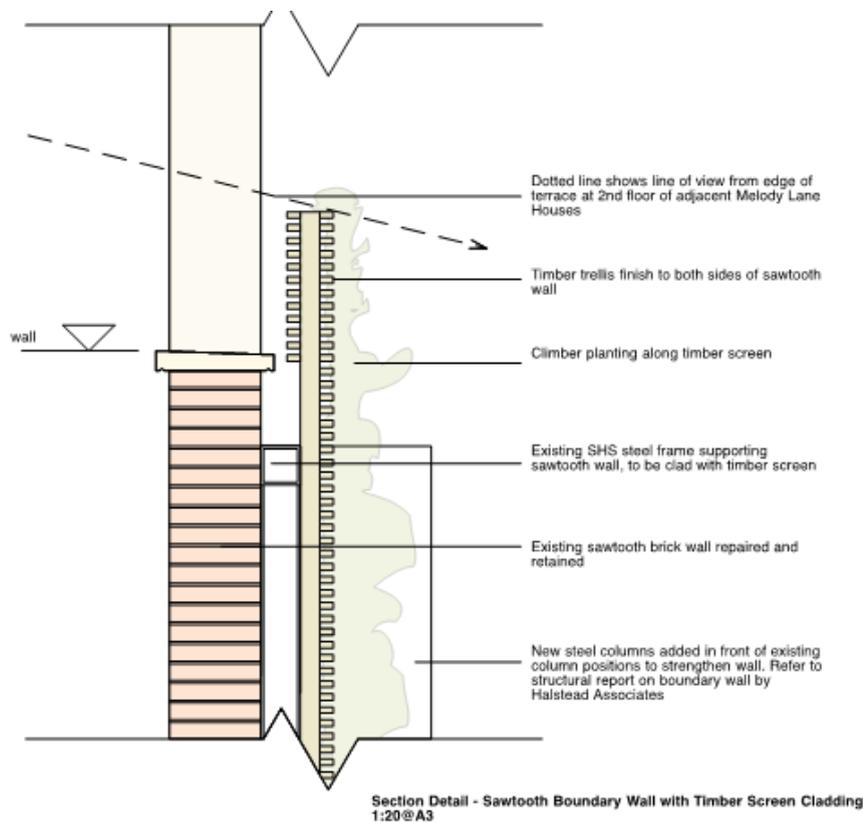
Section through the proposed sawtooth wall and timber screen.
